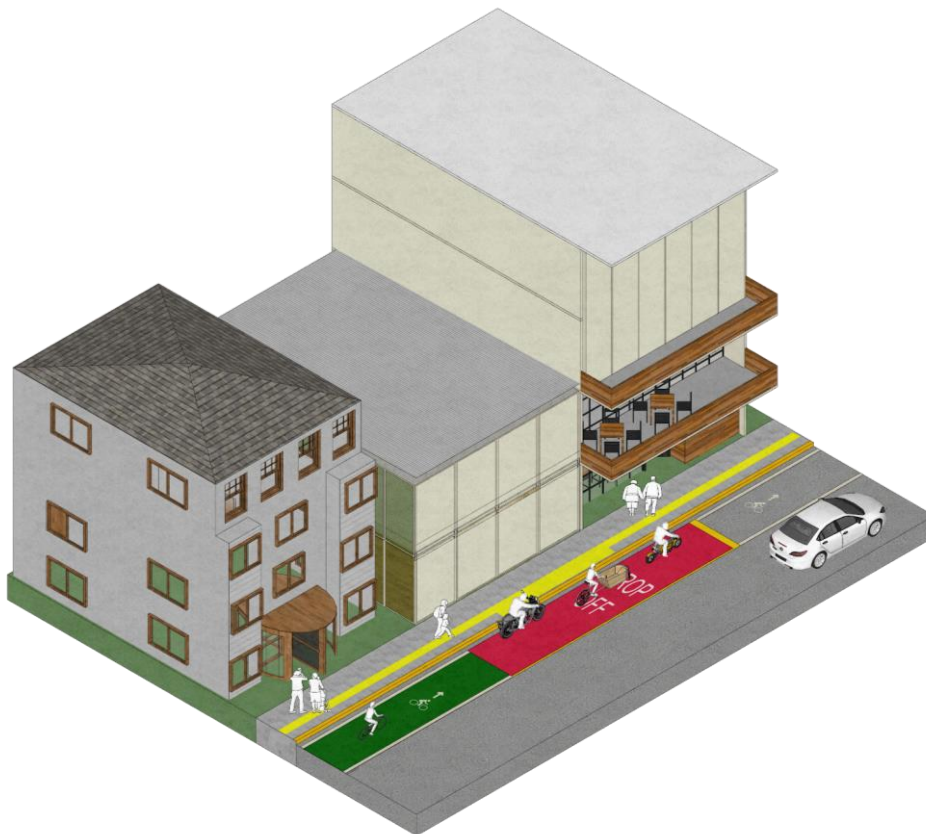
Pick-up and Drop-Off Zone for 2&3 Wheelers
